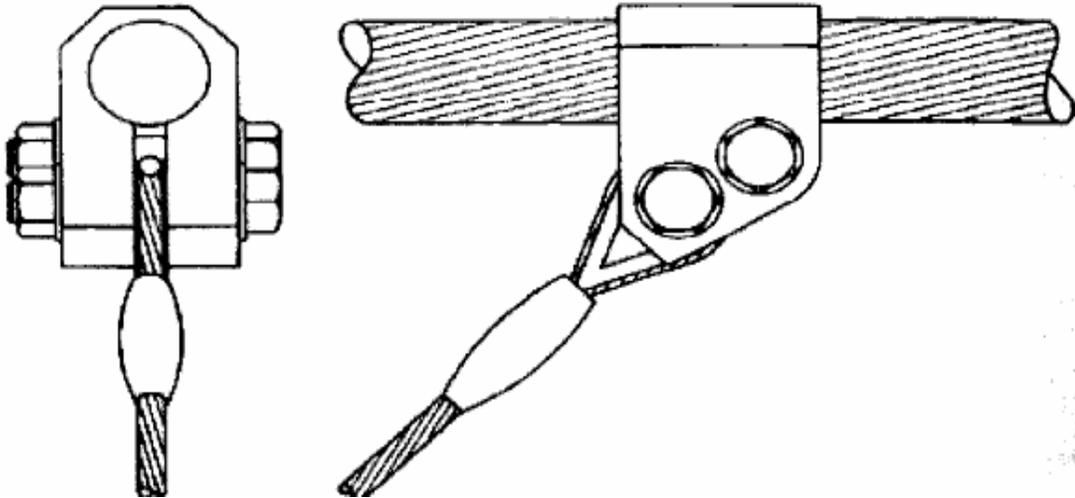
Detail showing clamp for connection of interior cable to edge cable
